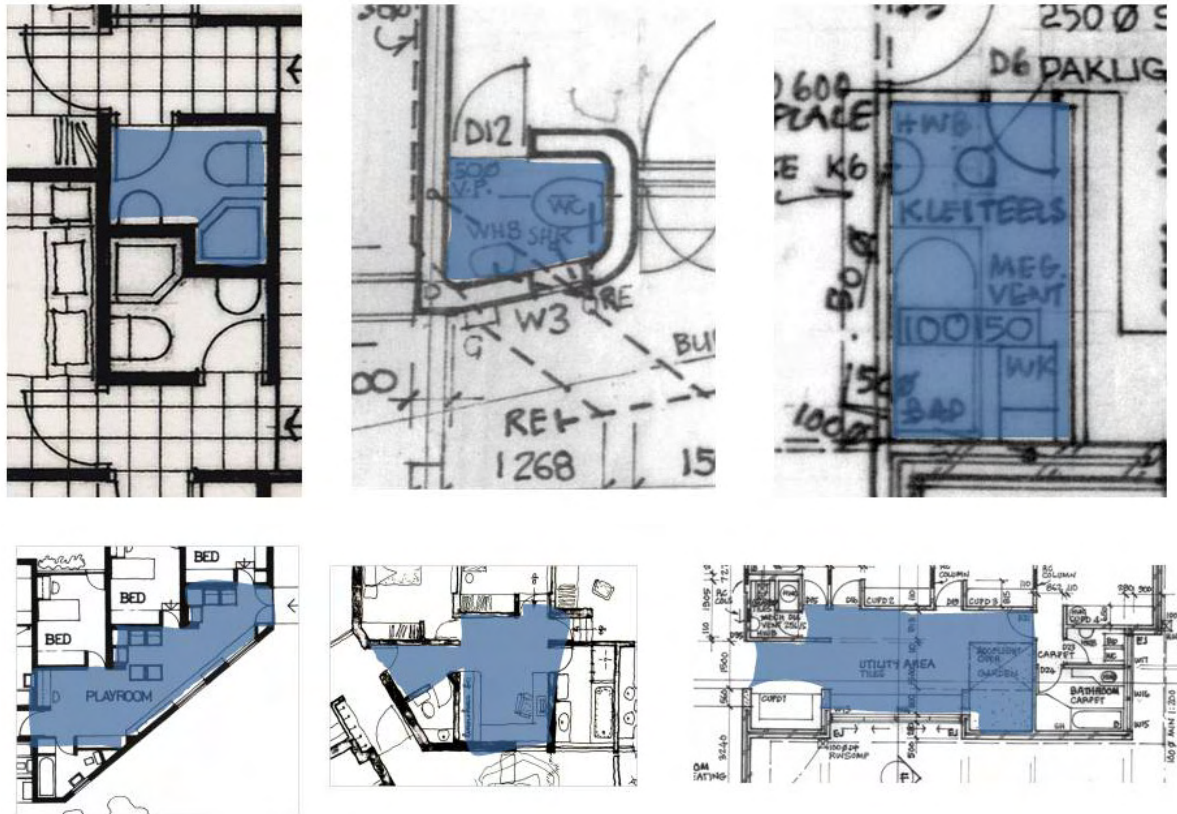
Top: Part plans of bathrooms (highlighted in blue) to House Swanepoel at Cape St. Francis(1980) (Fagan, 2005a:103), House Paradys (2003) (Fagan archive - Job No. 0204, 06/02/02) and House Beyers (1998) (Fagan archive - Job No. 9813, 03/11/1998). Bottom: Part plans of 'passage' spaces (highlighted in blue) to House Raynham (1967) (Fagan, 2005a:52), House Neethling (1983) (Fagan, 2005a:83) and House Auldearn (1992) (Fagan archive - Job No. 9302, 01/03/1993).
